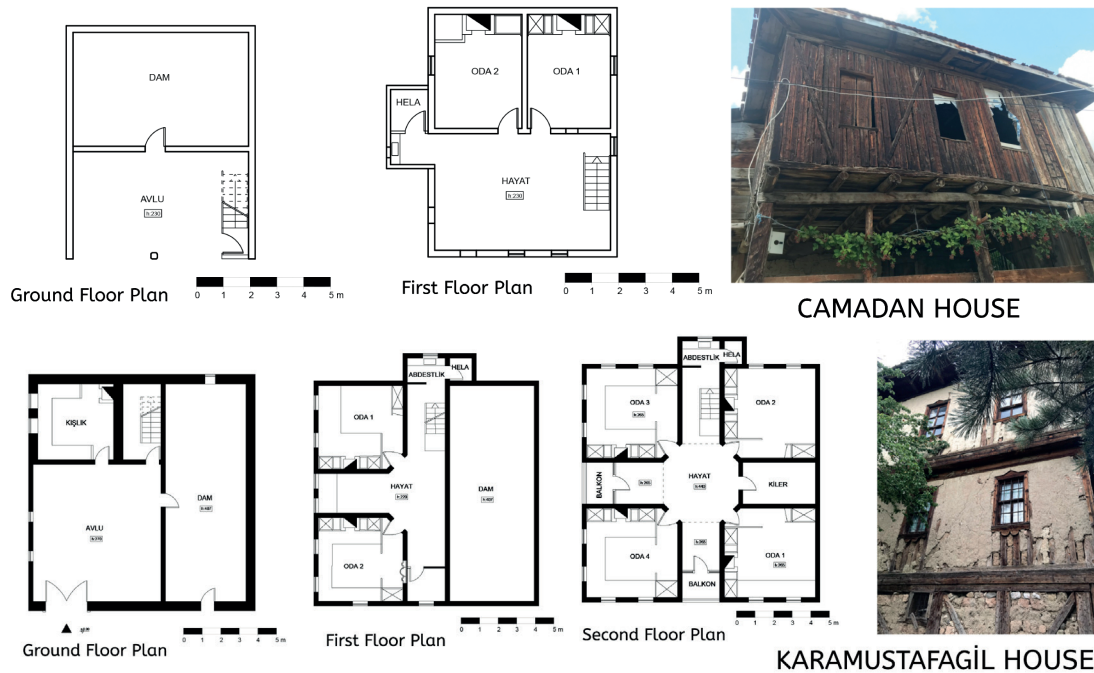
(a) plan type with outer sofa (Camadan house)<sup>1</sup>; (b) plan type with inner sofa (Karamustafagil house); drawn by the author
